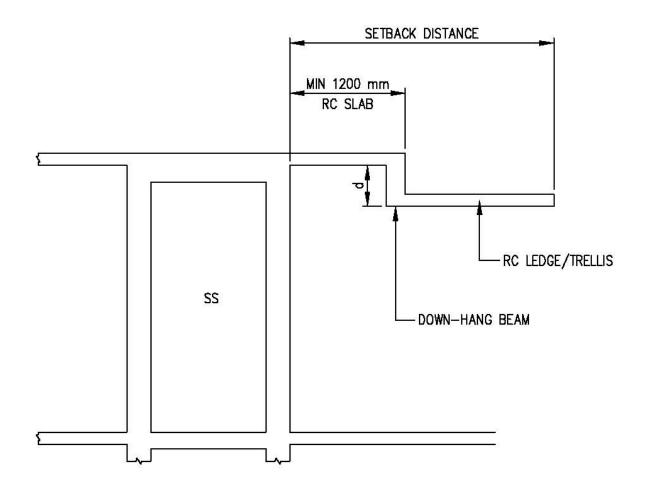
(a) REQUIREMENT ON SETBACK DISTANCE OF SS WALLS (WITH DOWN-HANG BEAM)
